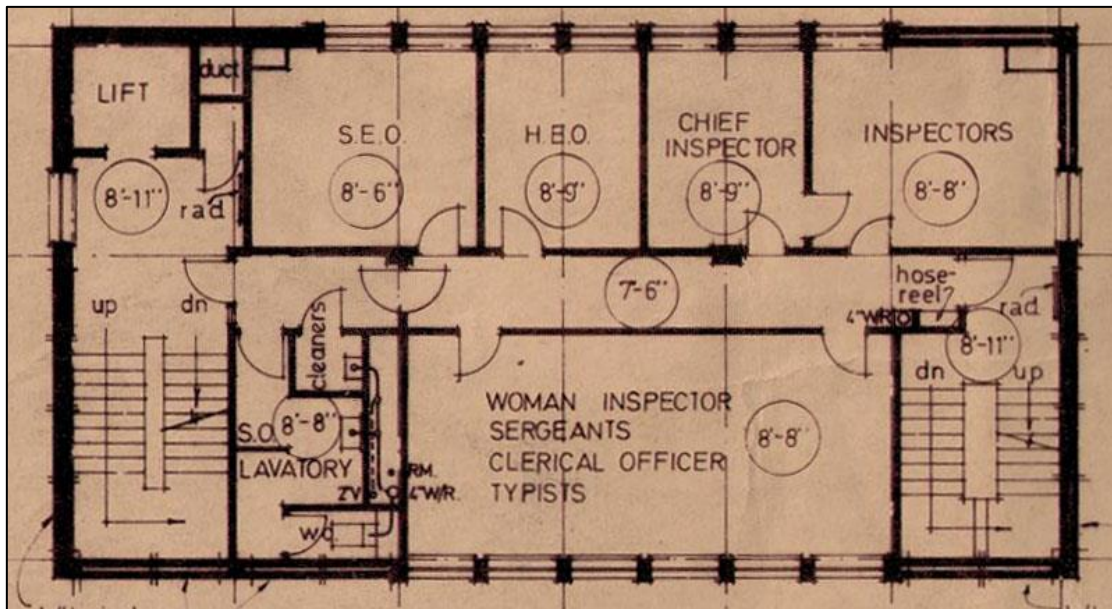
A 1984 second floor plan of the eight-storey tower block demonstrating the central corridor plan (Chief Engineer's Office, Metropolitan Police)
